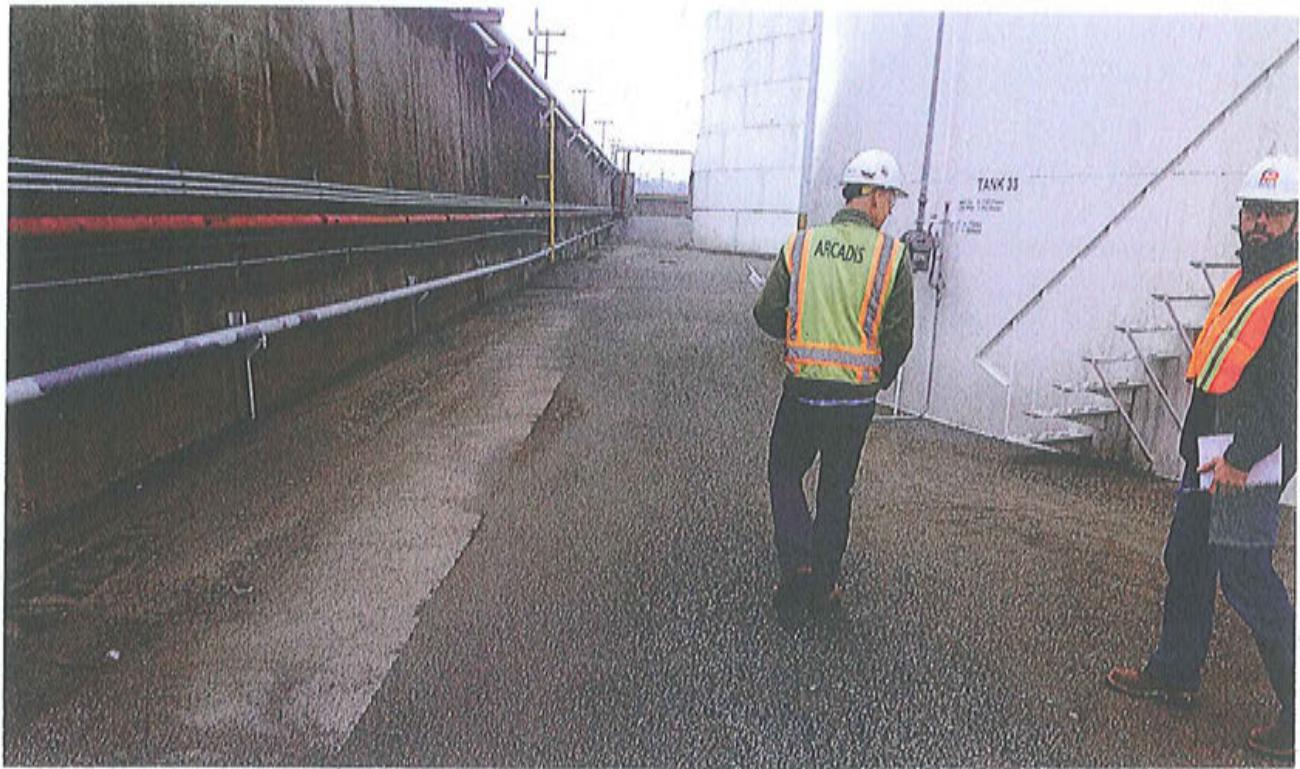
KMLT Above ground petroleum Storage Tank No. 33 at B Yard with containment wall and piping on left with two Arcadis consultants conducting the site inspection.
